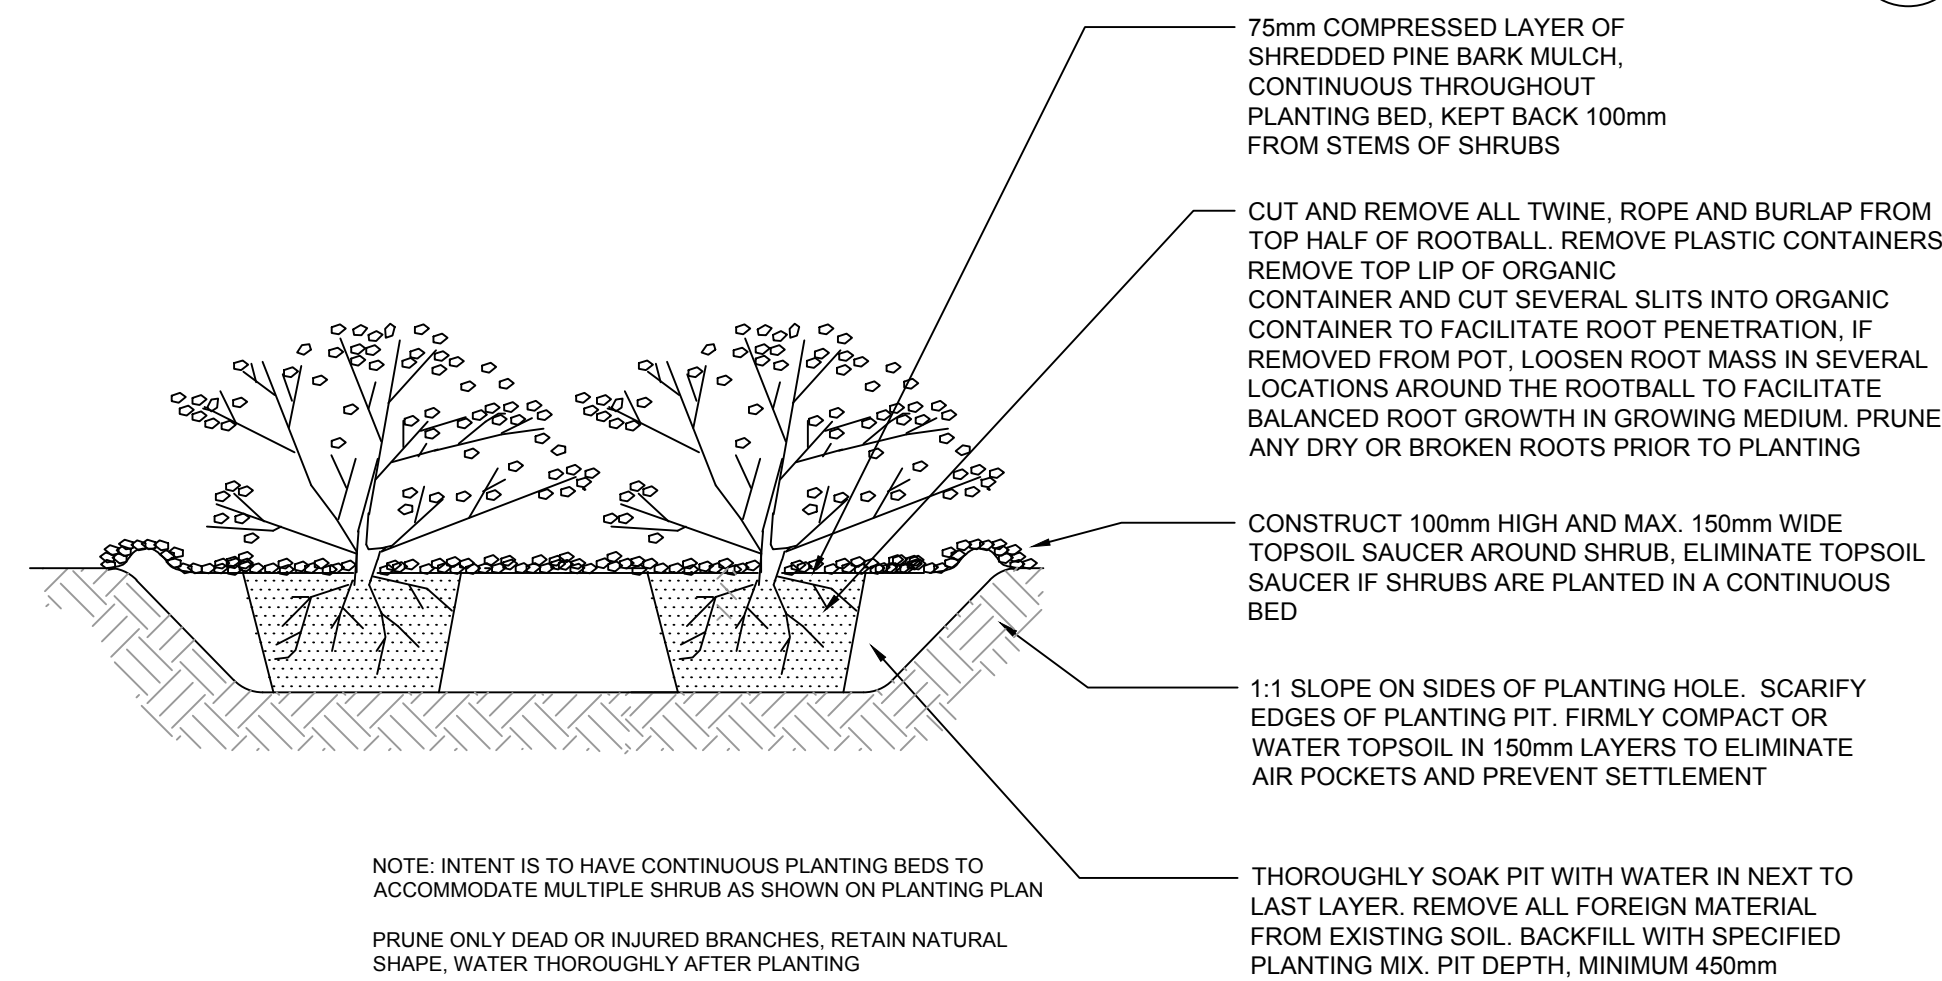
DETAIL MULTI-STEM DECIDUOUS SHRUB PLANTING
